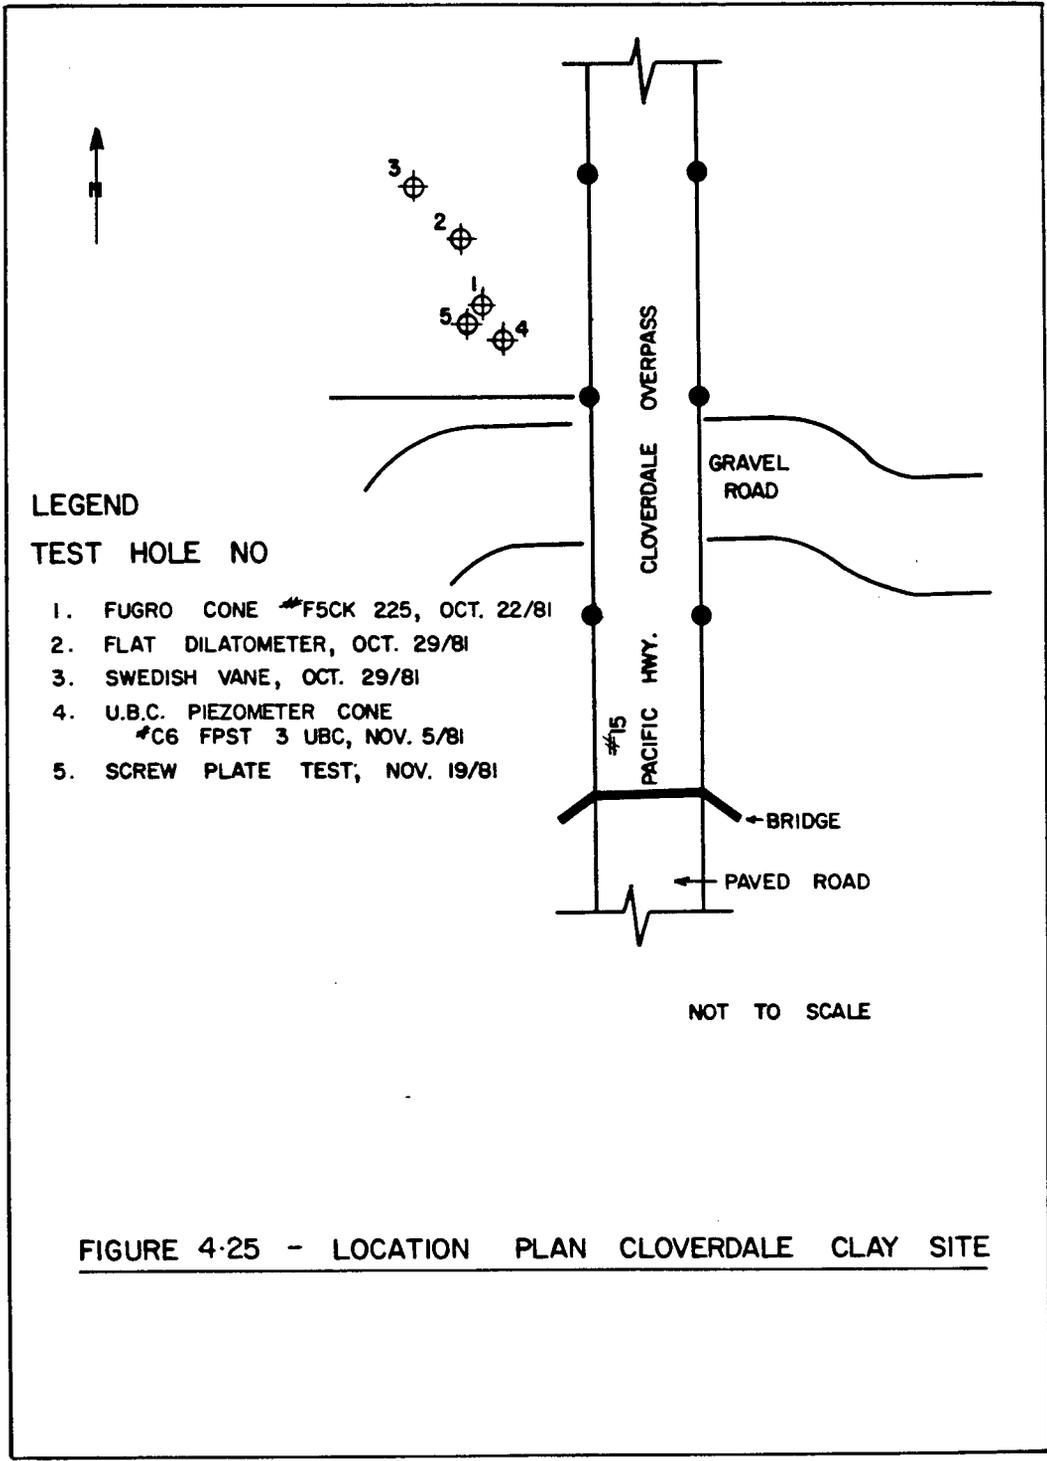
LOCATION PLAN CLOVERDALE CLAY SITE
